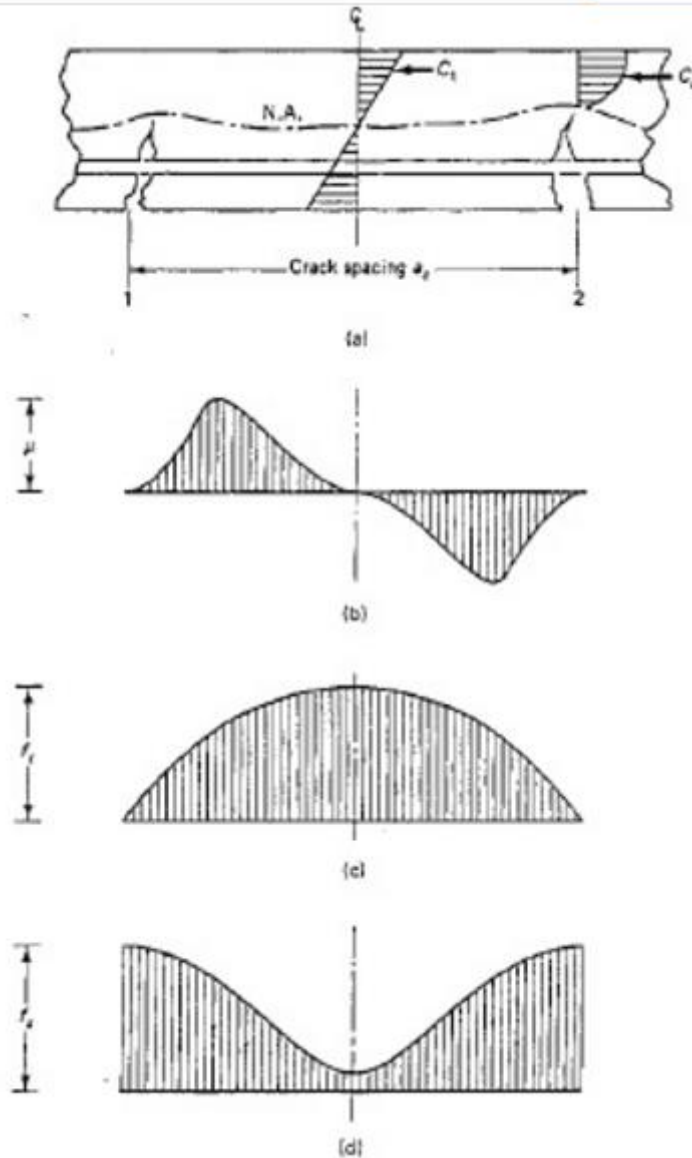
Longitudinal stress distribution between adjacent cracks; (a) crack development geometry; (b) ultimate bond stress; (c) longitudinal tensile stress in the concrete; (d) longitudinal tensile stress in the steel
